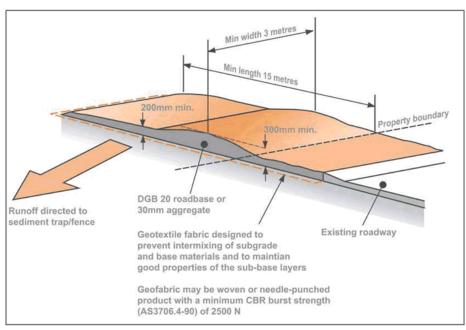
Stabilised Site Access Source: Soils and Construction: Managing Urban Stormwater, Landcom, March 2004.
